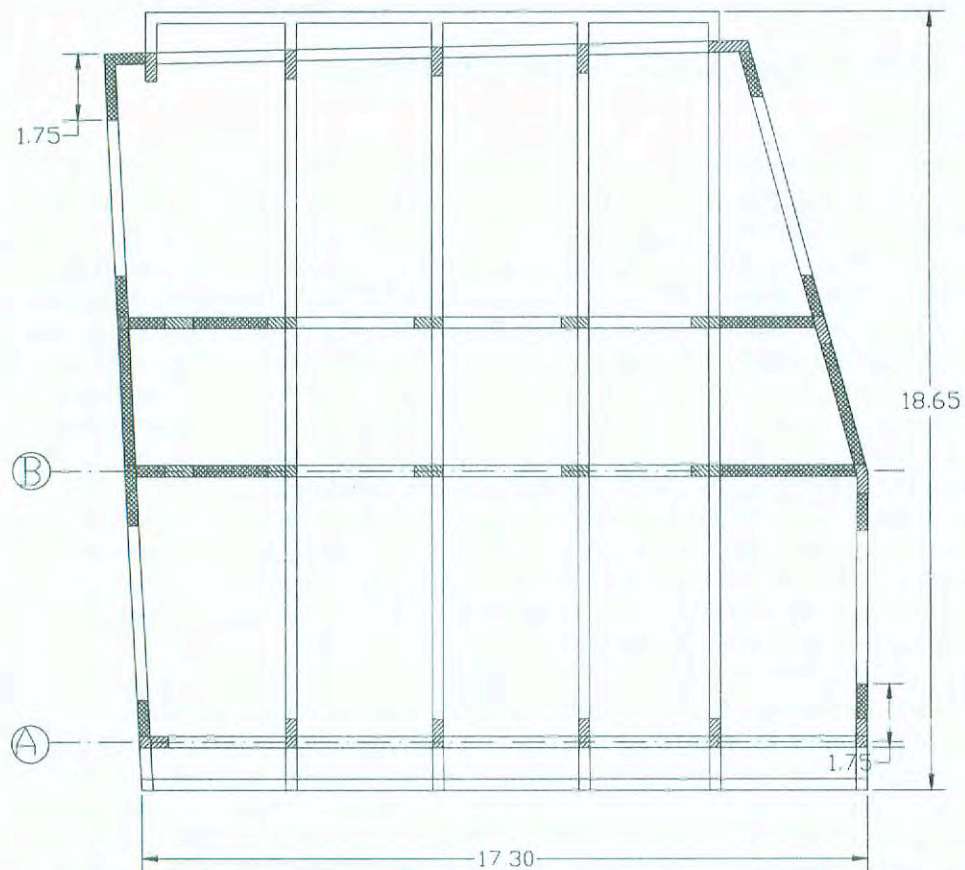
Retrofitting scheme applied to the ground storey plan of the four storey building in Dinar. Cross-hatching indicates the added shear walls
